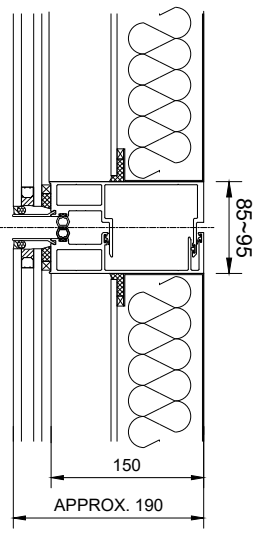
plan detail for typical vertical mullion, through spandrel zone
